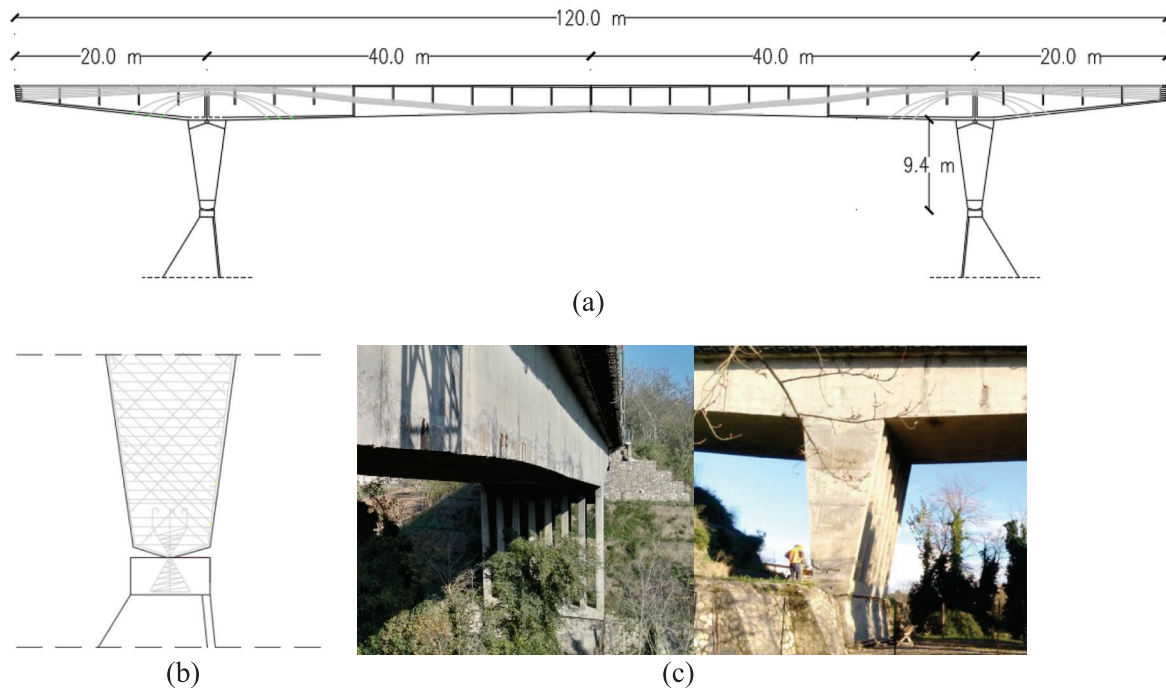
(a) Longitudinal scheme of the bridge; (b) Detail of the hinge and (c) views of the pier.
